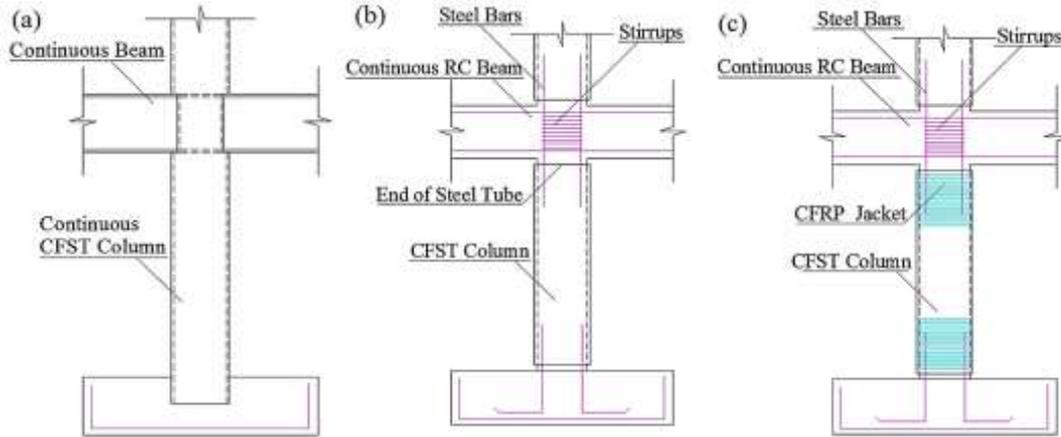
(a) Continuous beam passes through continuous CFST column. (b) CFST column connected with continuous reinforced concrete beam. (c) CFRP jackets added to CFST columns.
